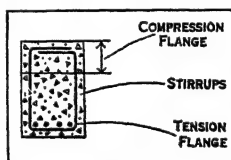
CROSS-SECTION OF RECTANGULAR CONCRETE BEAM
